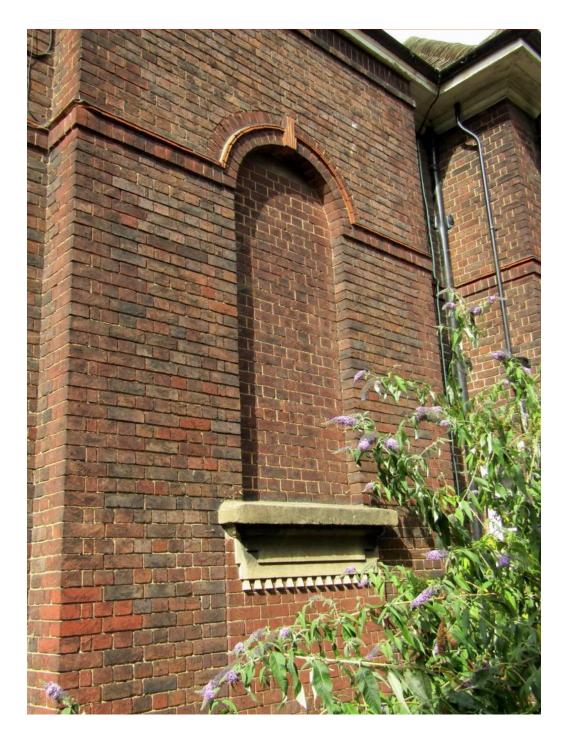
architectural detail to bottom of window to side elevation of chapel
